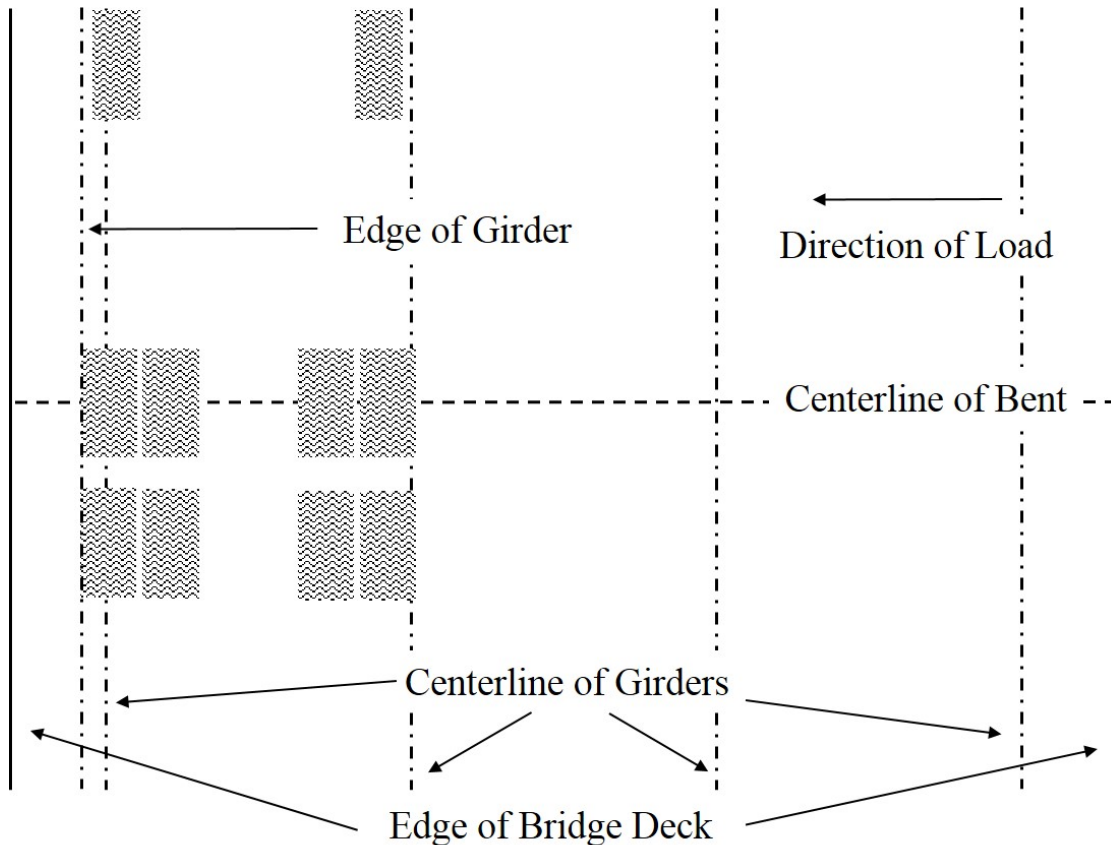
Placement of Load Truck during the Fourth Macon County Road 9 Bent Load Test
